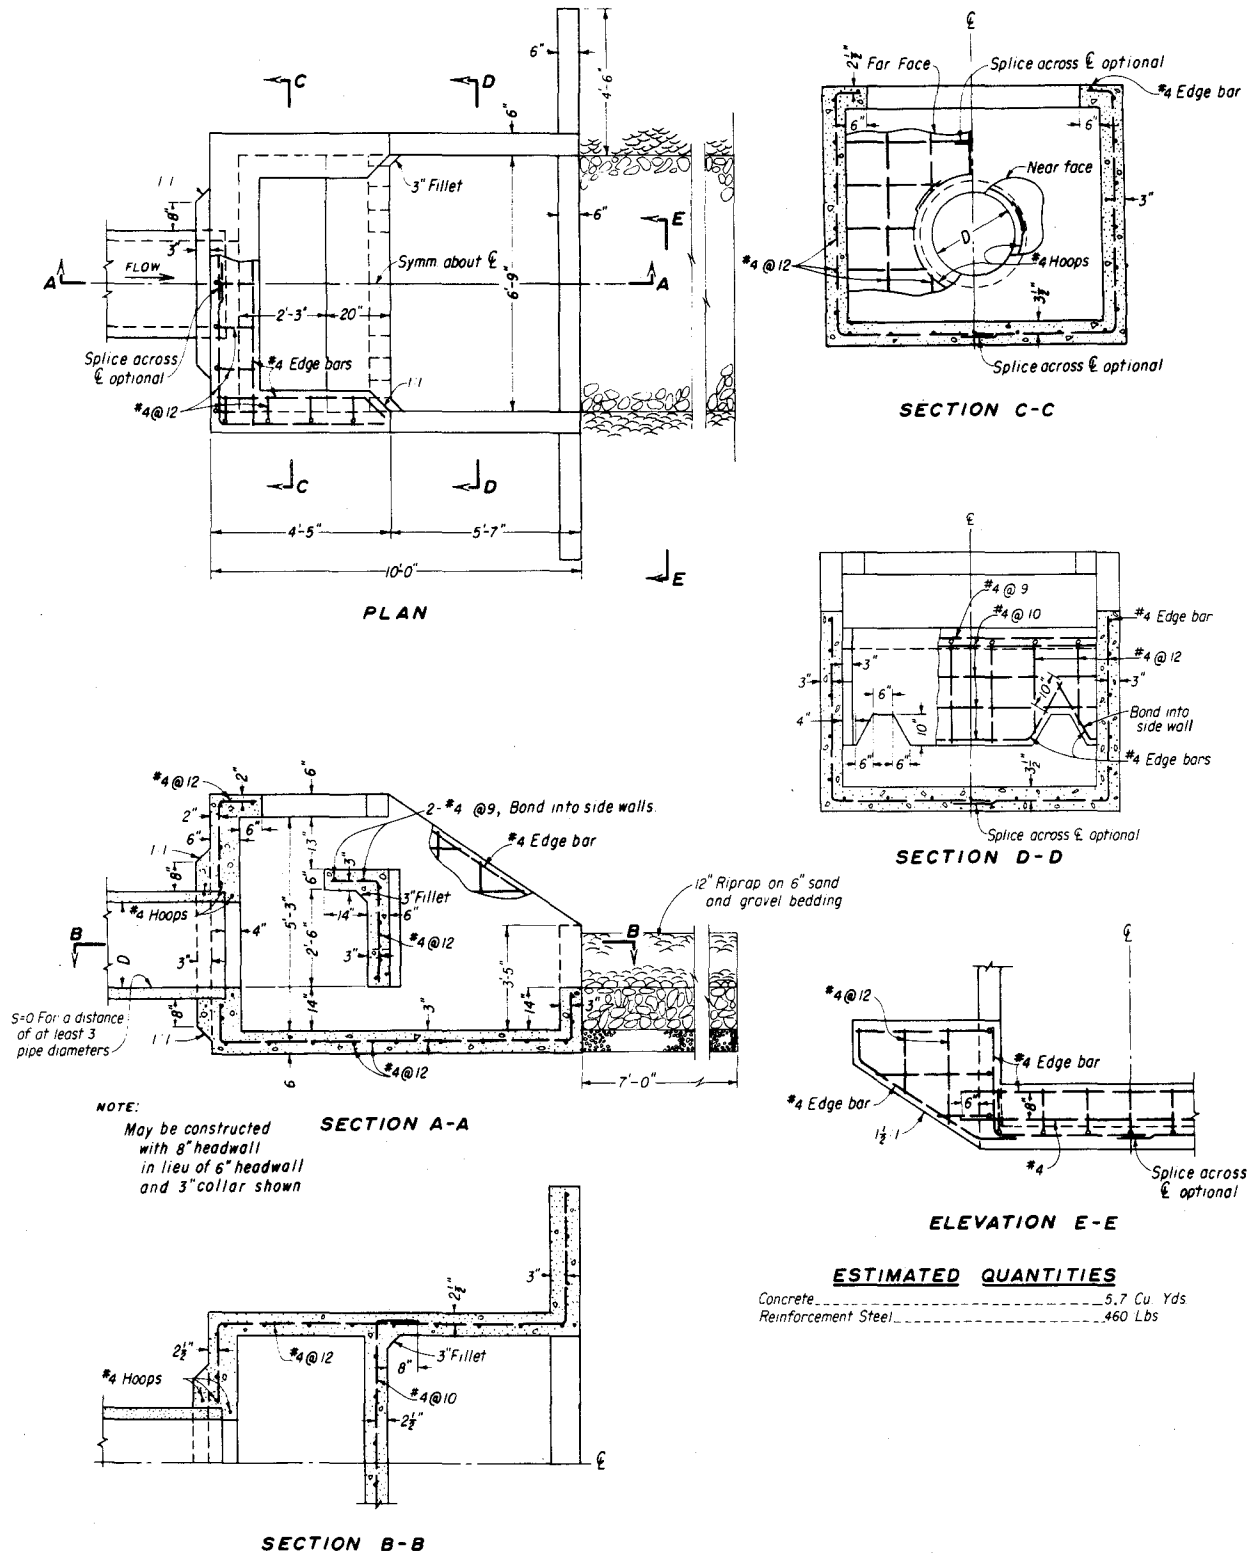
Type 4 baffled outlet. 103-D-1343
